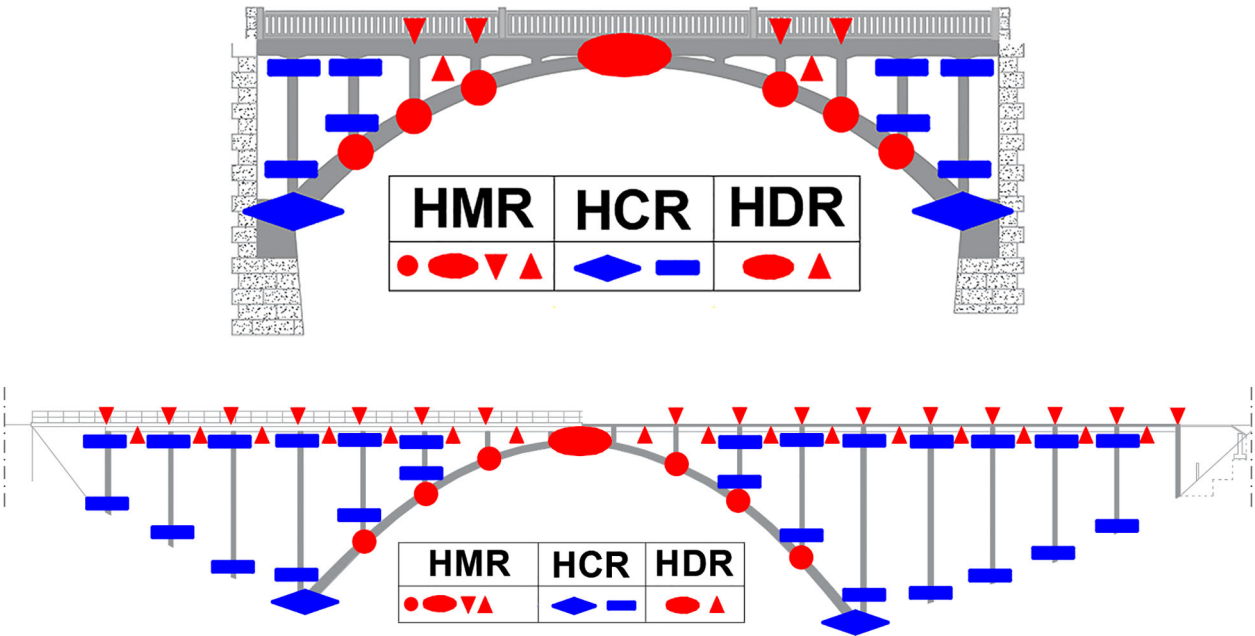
Vulnerable zones. (a) Bridge A. (b) Bridge B.
